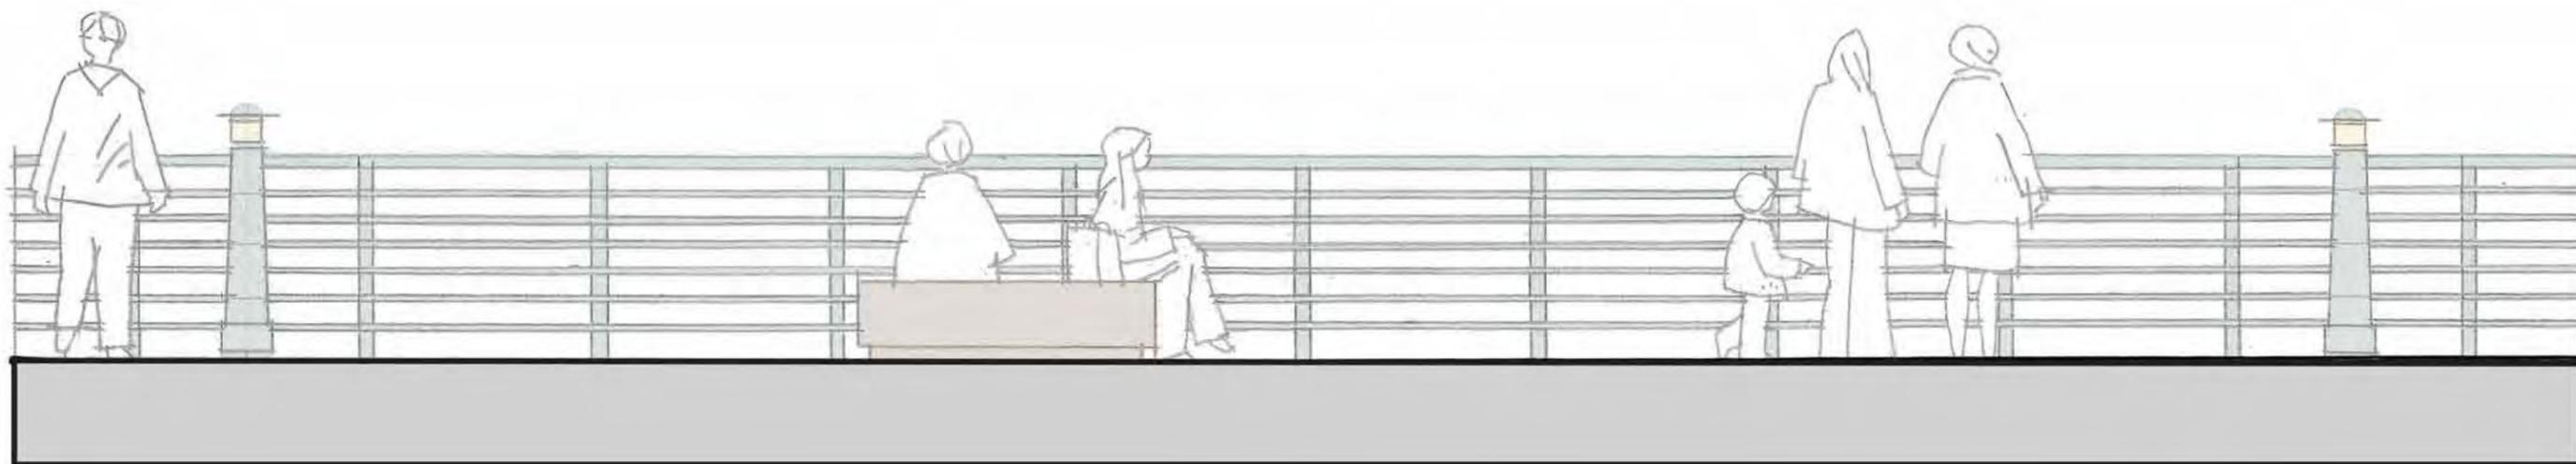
Guard Rail Option - Type D, typical elevation of Promenade edge with metal rail, integrated with mid-height bollard lights
